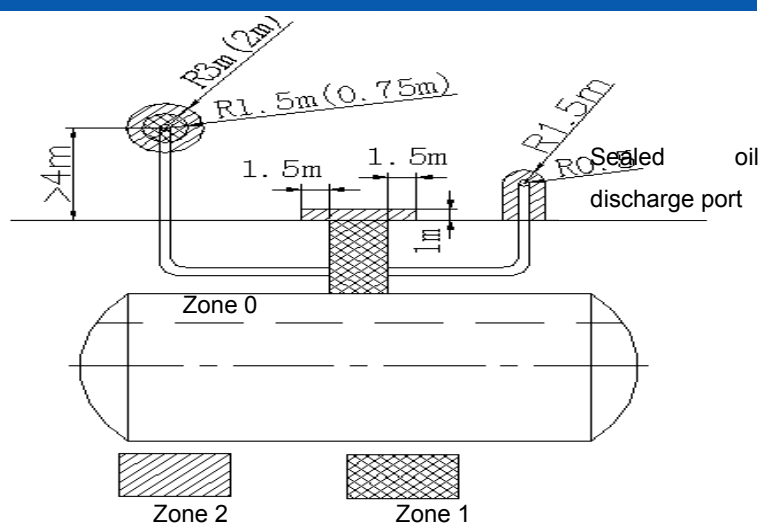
Division of explosion hazard zones of underground horizontal tank
